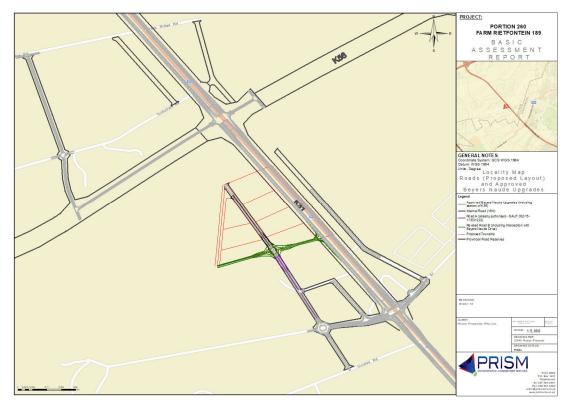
Roads and Approved Beyers Naude Upgrade – Proposed Layout
